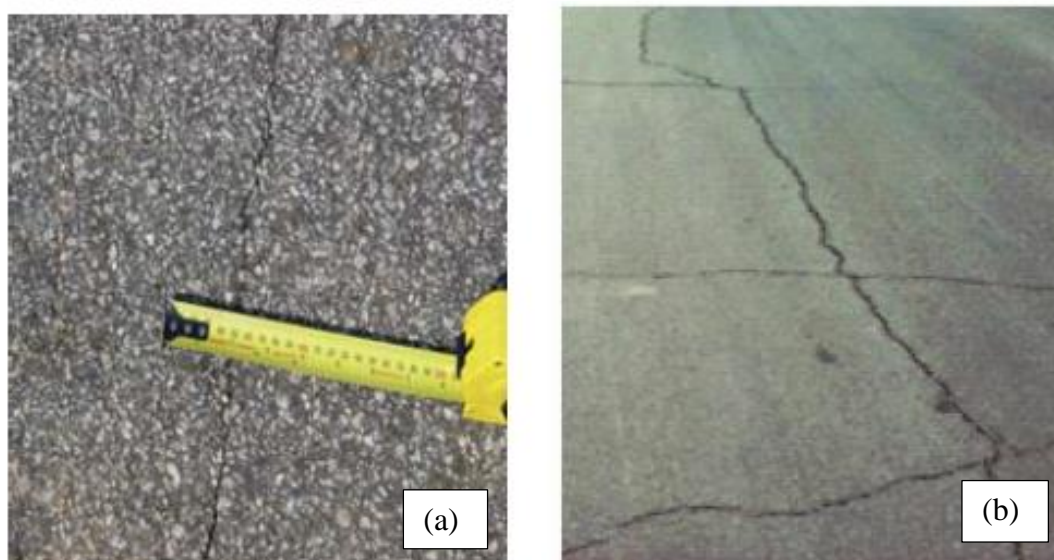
Cracks reflected on the pavement surface layer (a) Narrow cracks (b) Wide cracks (Adaska et al. 2004).
